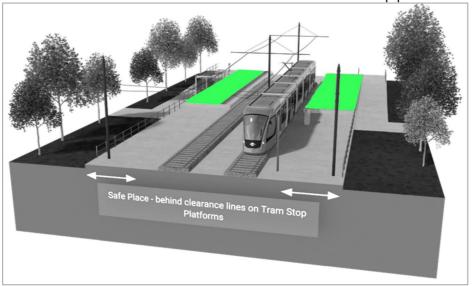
Example of Safe Places on Tram Stop Platforms – Closed Tram Corridor
